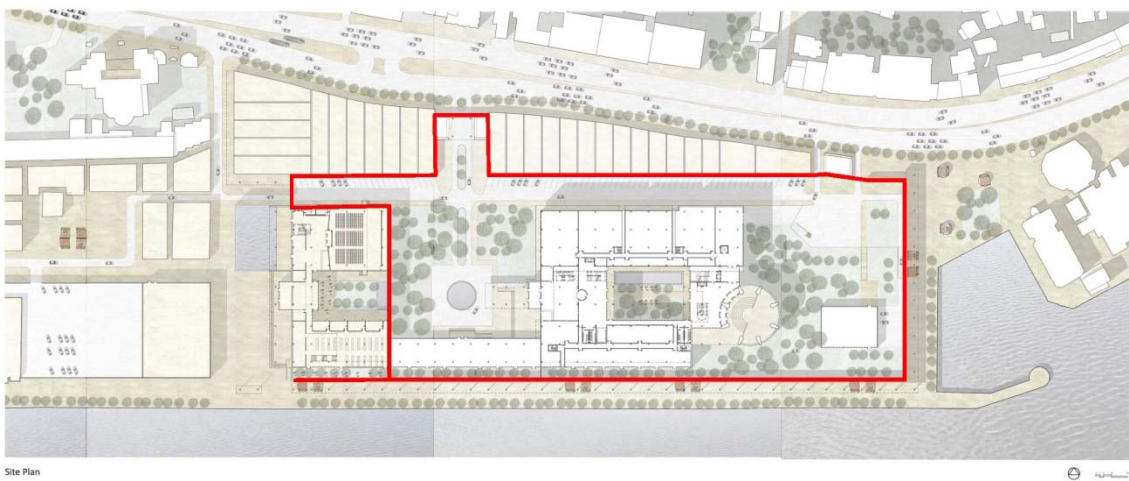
Proposed Perimeter Blast Wall. Image by author.
